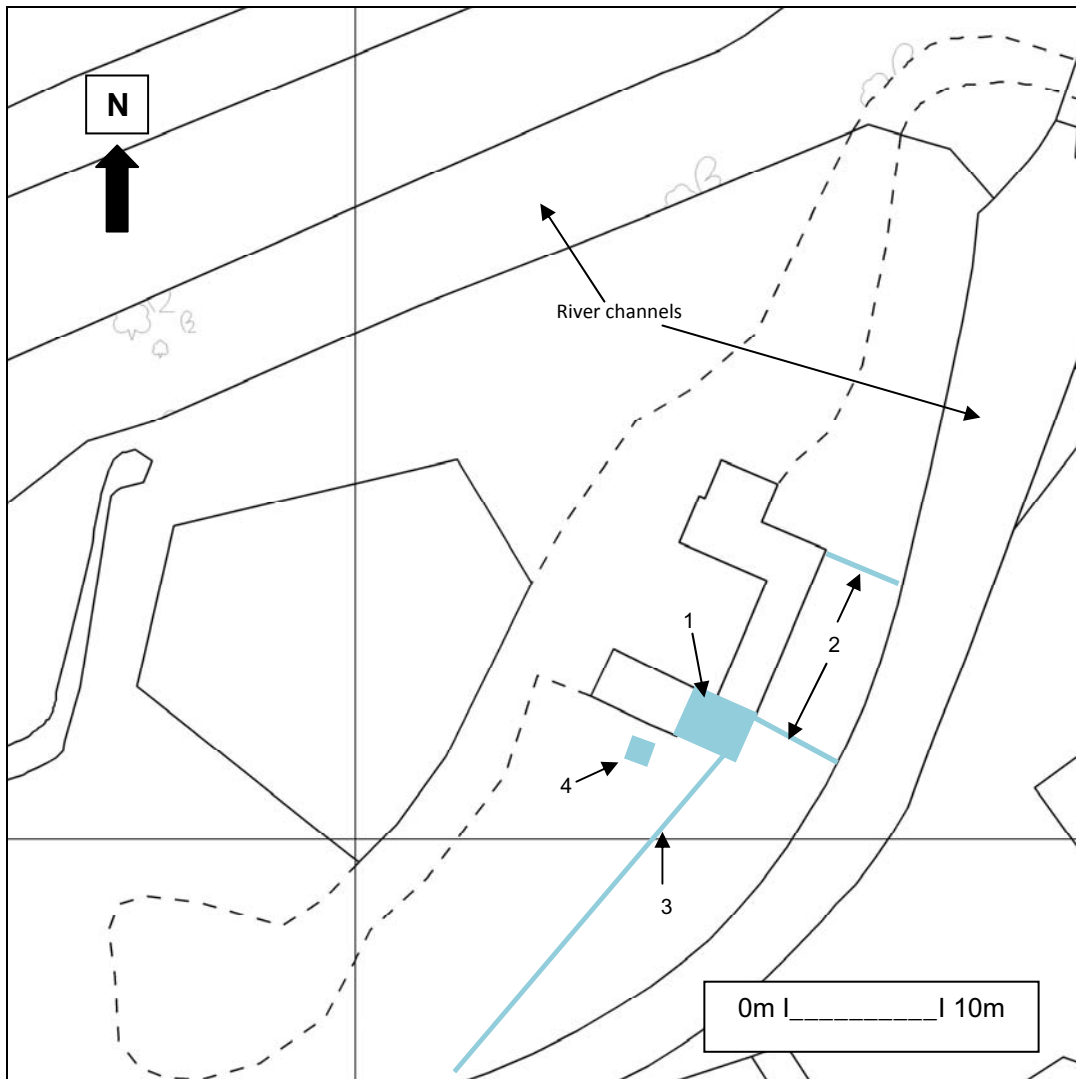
Monitored areas of ground work (1- slab foundation, 2- pipe trenches, 3- cable trench, 4- septic tank pit)
